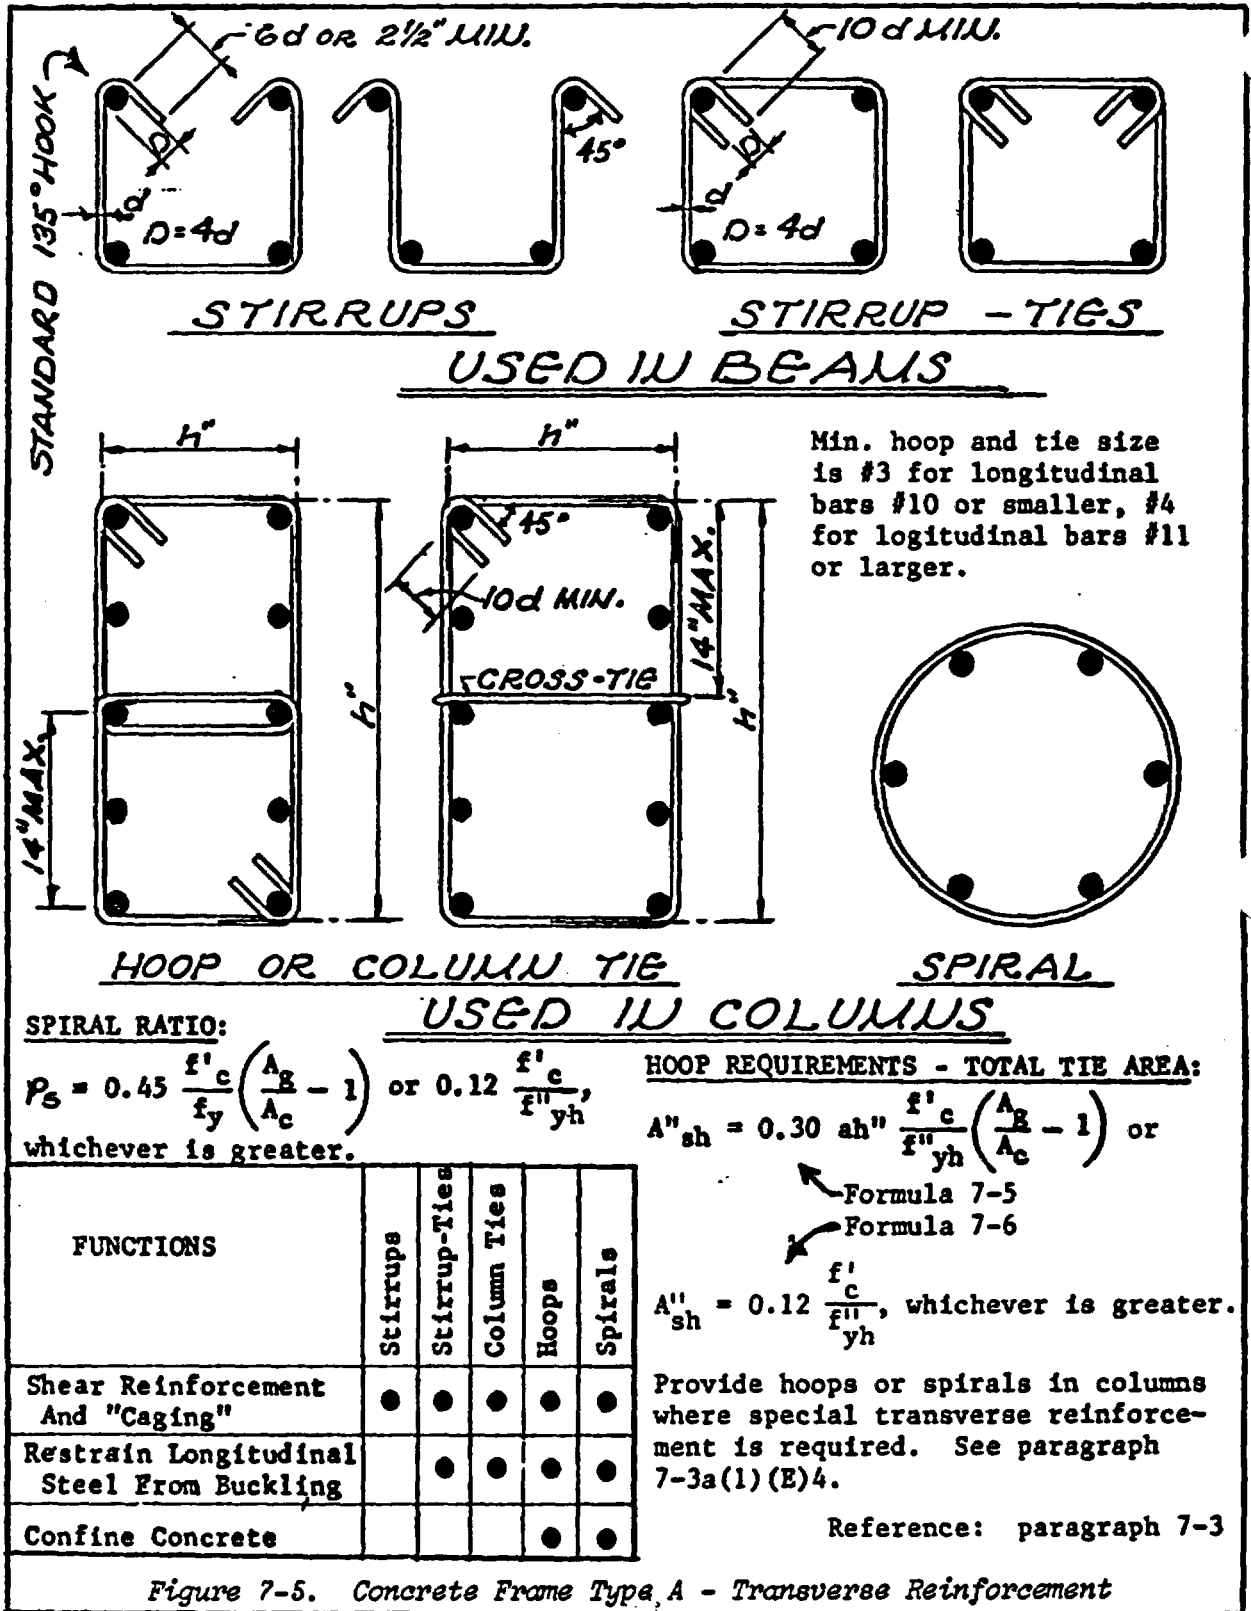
Concrete Frame Type A - Transverse Reinforcement
